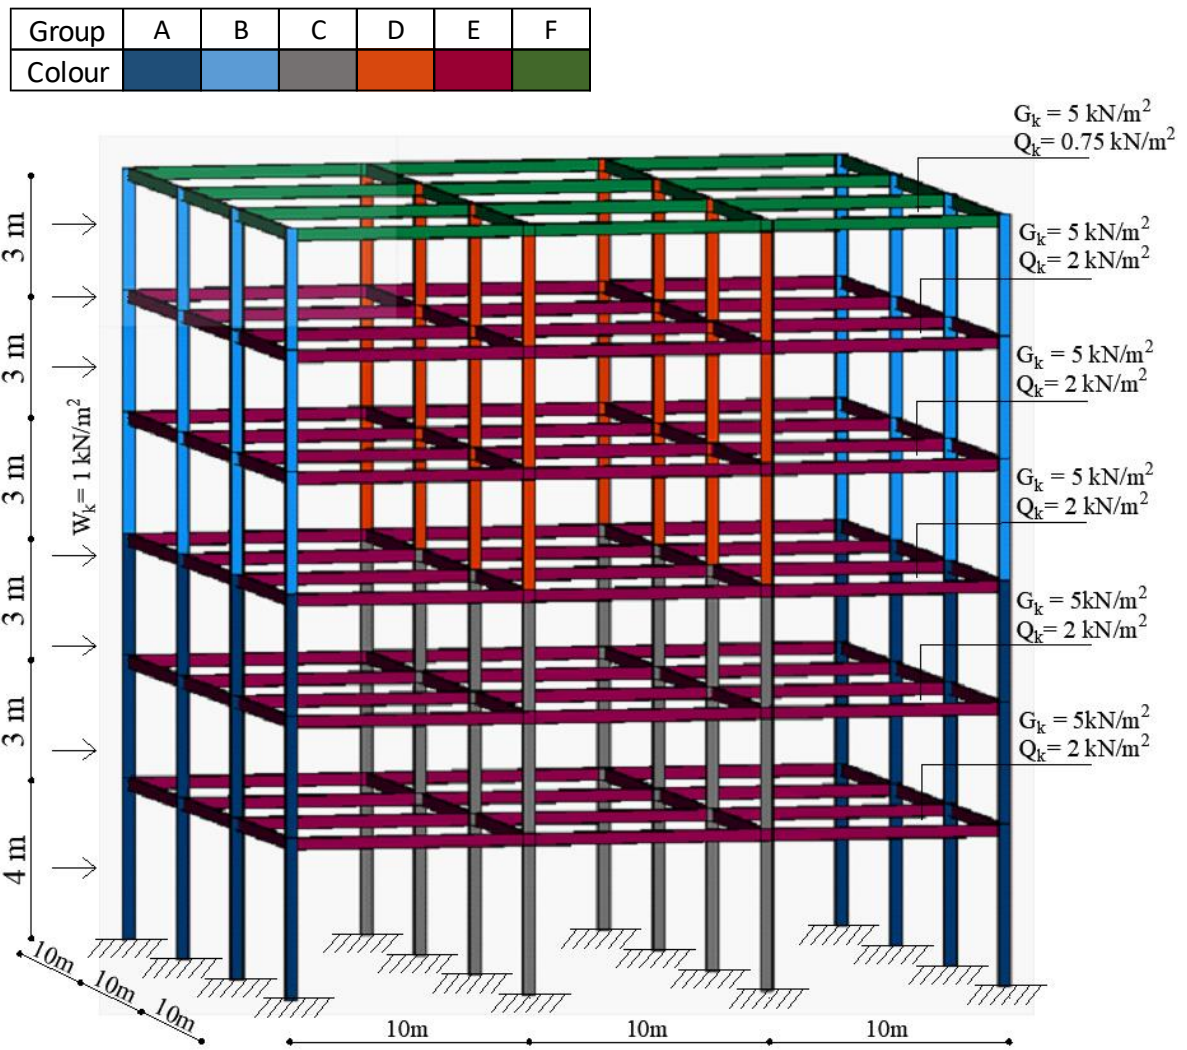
Layout and loading of the six-storey structure with (3X3) bay
